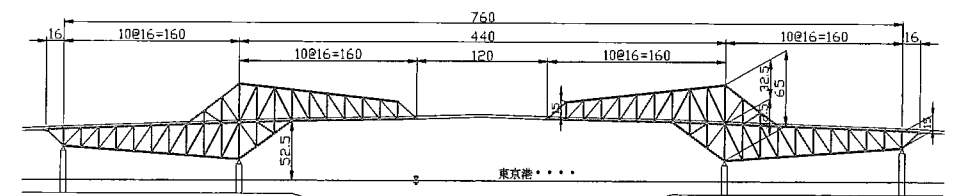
Basic structure plan of No.3 Seaway Bridge
